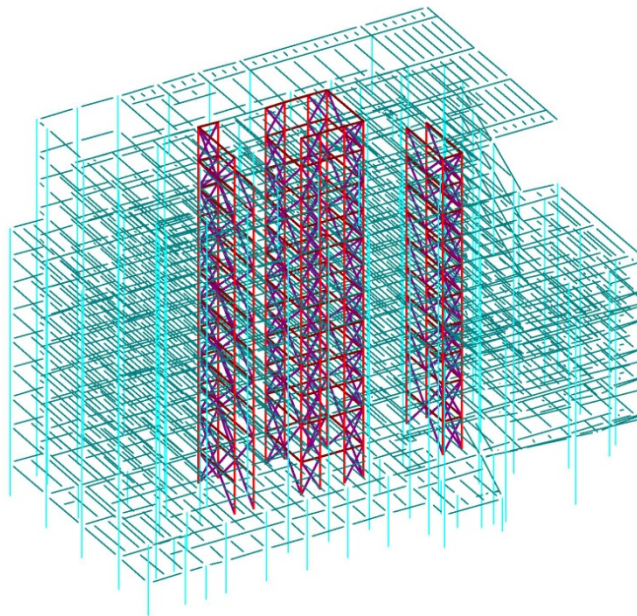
RAM Model of Steel Gravity Framing, Braced Frames, and Moment Frames
